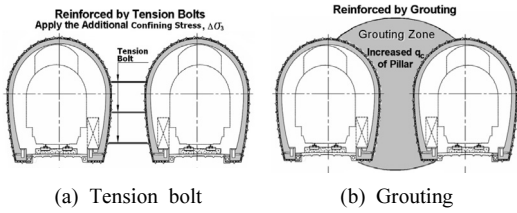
Typical pillar reinforcement methods (Baek et al., 2009)
